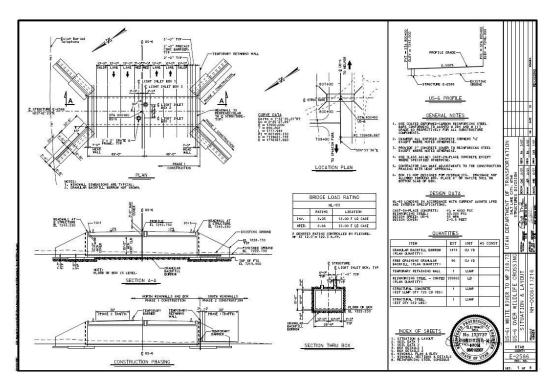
Utah DOT Plan for Wildlife Crossing Box Culvert under Five Lanes of Traffic for US 6
